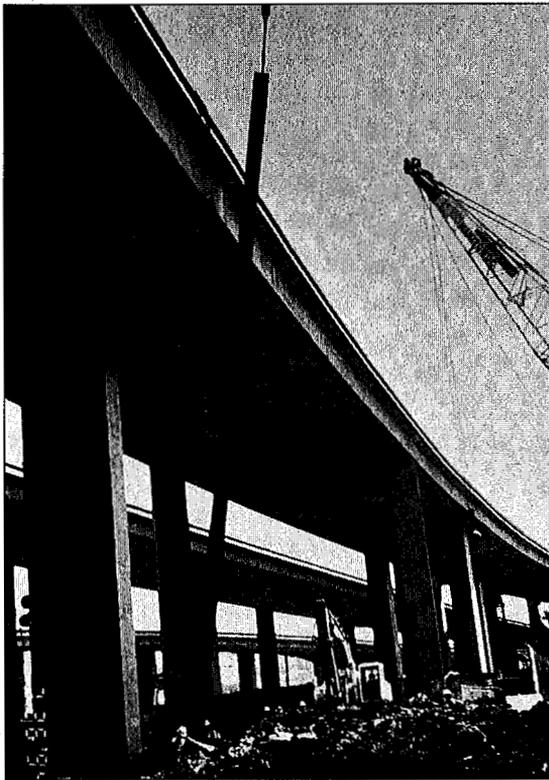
Beam placement beneath the I-280 viaducts at the West T/S.
